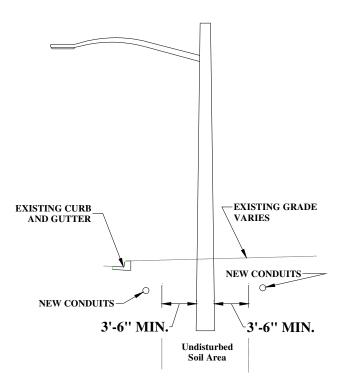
Minimum Separation between SVP Pole Foundations and New Conduits
